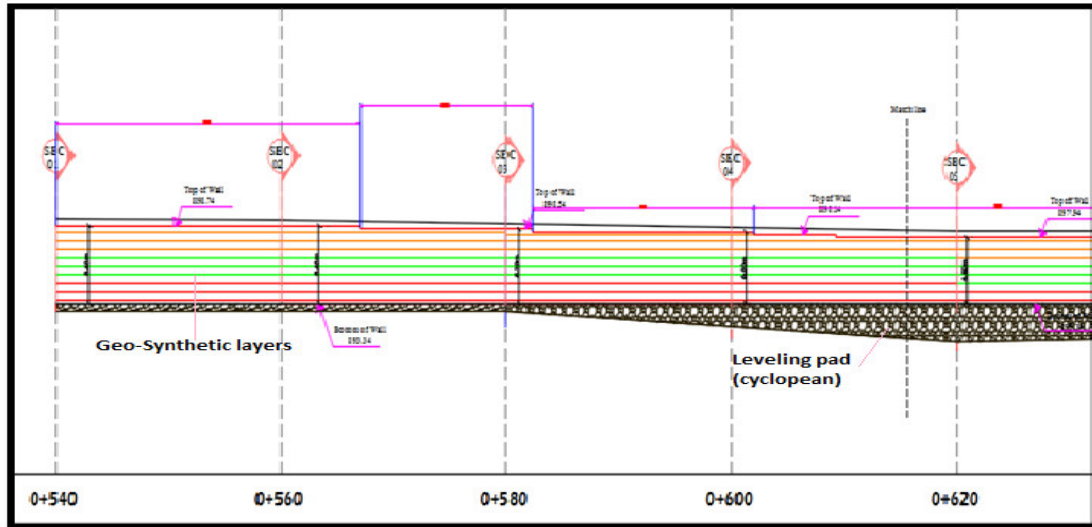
A General Profile Plan for the Geo-Synthetic (Fortrac) Reinforced Soil Wall (from Station 0+540 to Station 0+620)
